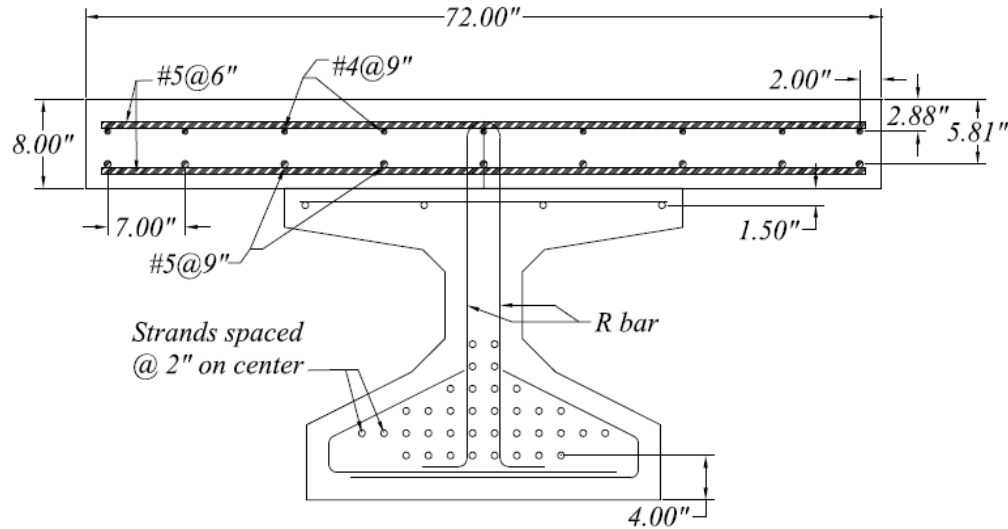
Reinforcement detail and strand layout for the specimens (Tx-28)
